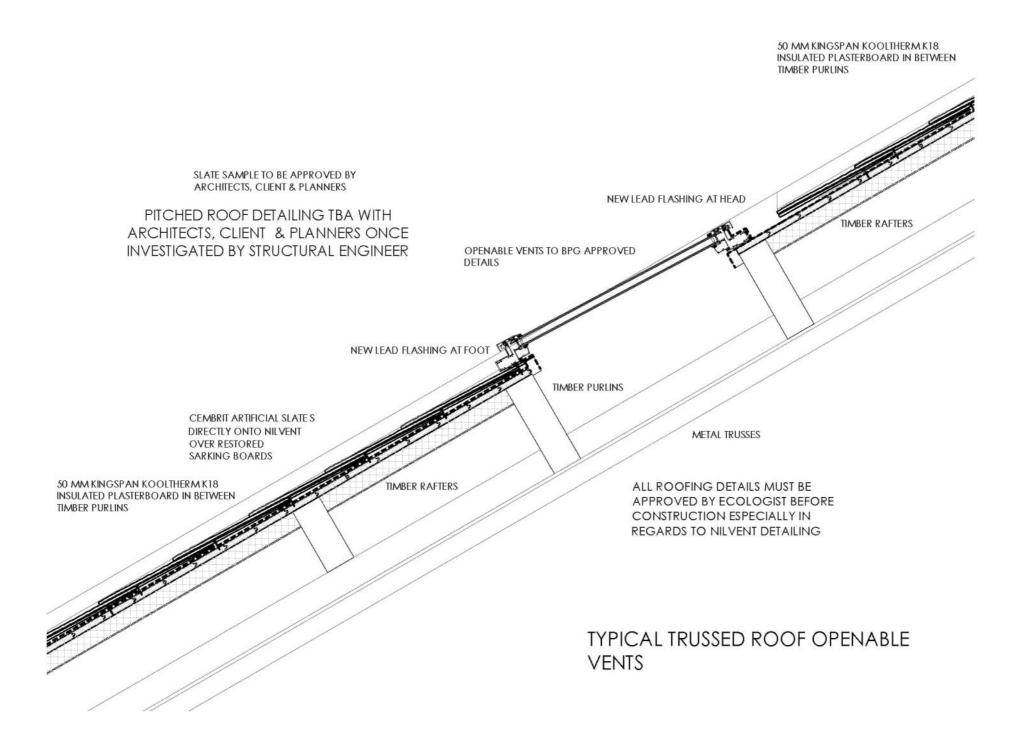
Proposed replacement patent glazing to roofs; new openable vents
